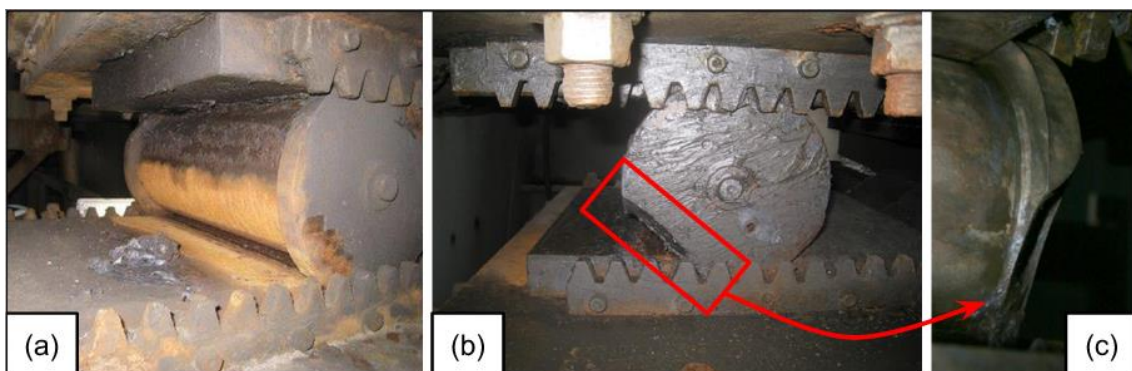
Damaged gears: (a) corrosion on a bearing and bearing plate, (b) and (c) damaged flange. (Courtesy: Bill Harvey Associates and Pembrokeshire County Council)
